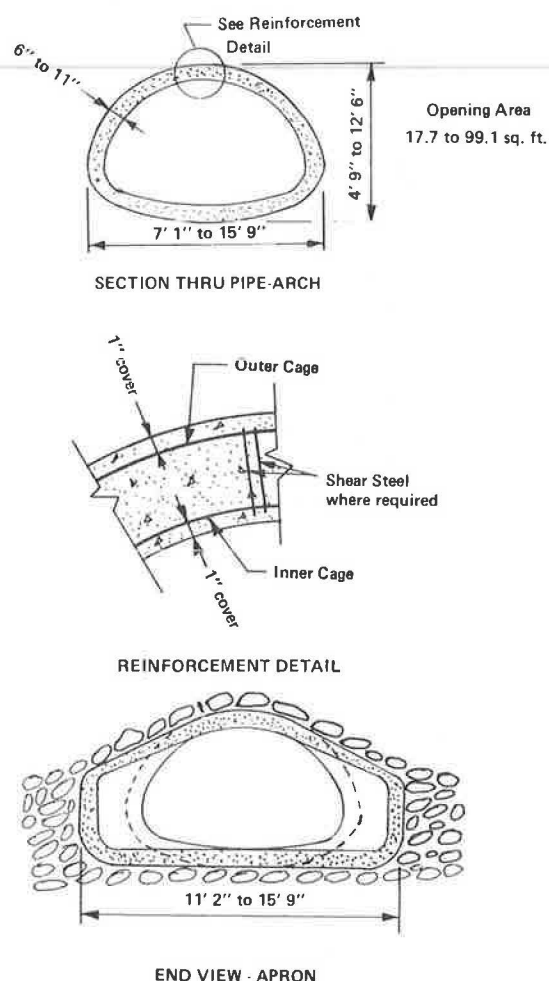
Typical geometric details of precast concrete pipe-arch structures.
